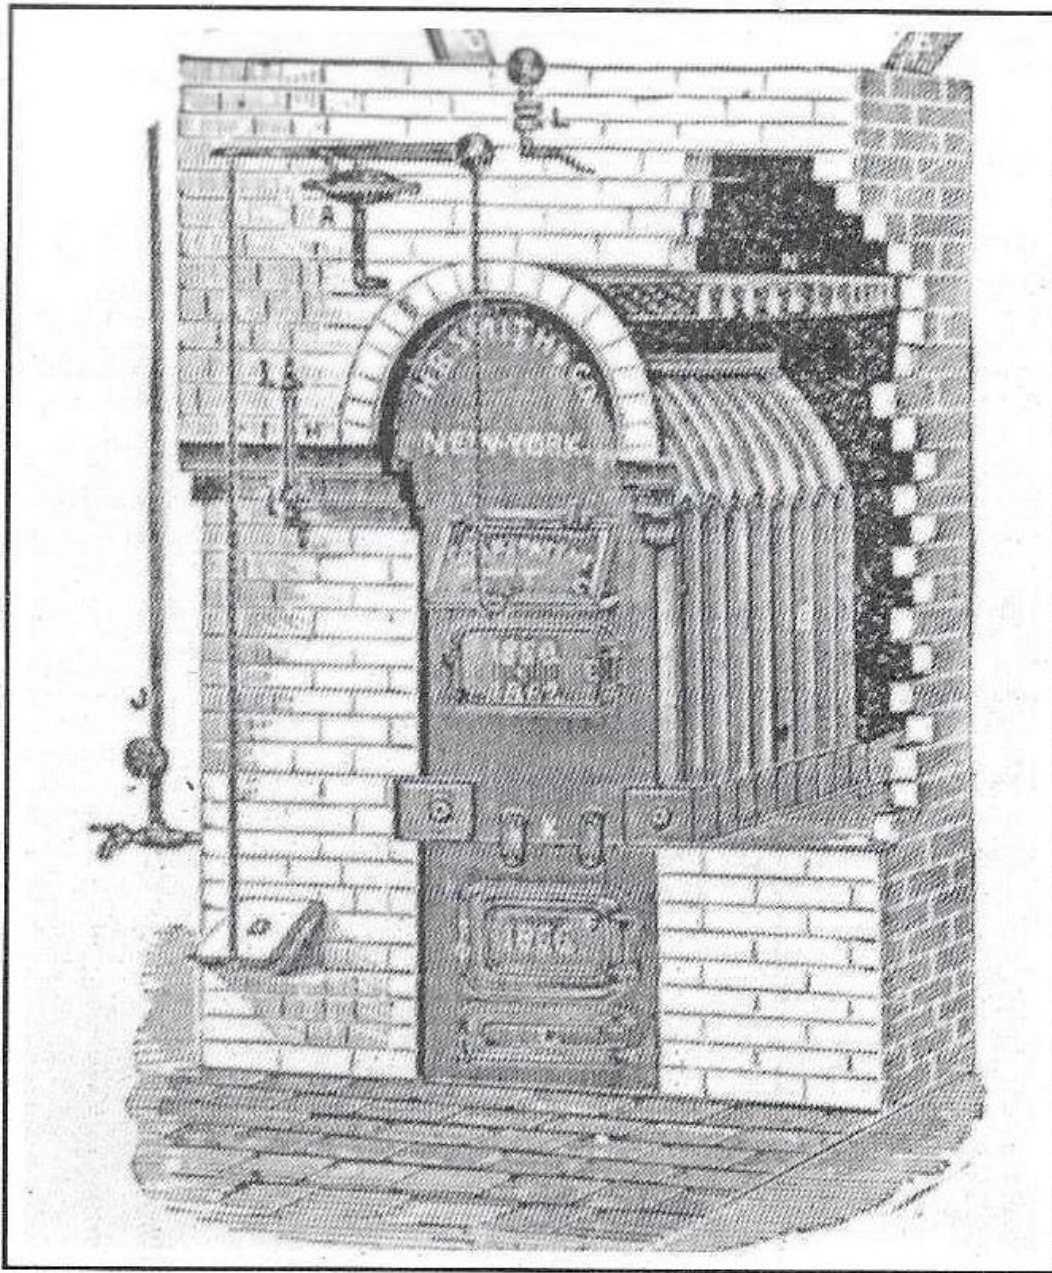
Original Gold boiler, 1859. *"The original Gold boiler—first boiler to be manufactured by H.B. Smith & Co.—in its first form consisted of an assembly of vertical cast iron sections held together with draw bolts and gasketed at the joints. These boilers were invariably installed in brick chambers and fed steam to indirect pin type radiators in the same chambers thereby warming air that was duct conducted to the rooms. Steam also could be fed directly to crude radiators or pipe coils in more distant rooms"* (Stifler, 1960. H.B. Smith Co.).
